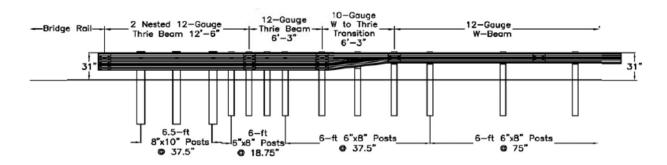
Adapted Simplified Steel-Post Stiffness Transition (Transition to Thrie Beam and Tube Bridge Railing Steel Post Version).
